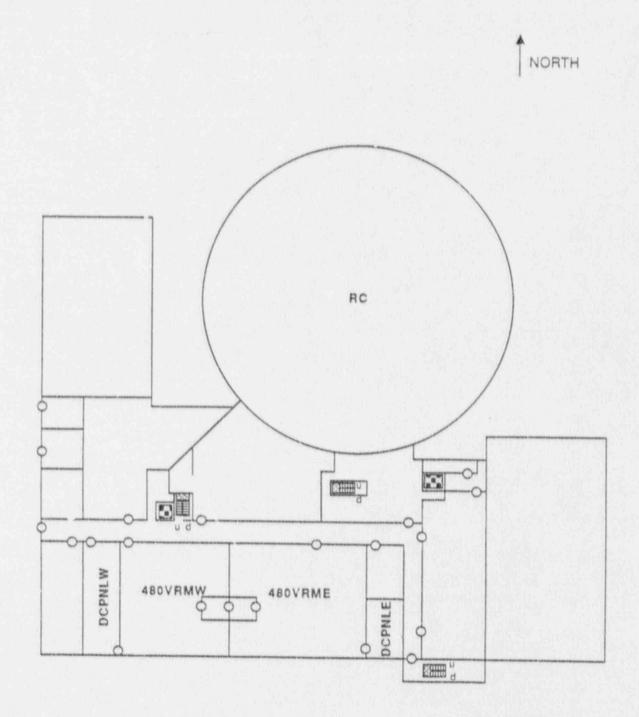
Rancho Seco Containment and Auxiliary Buildings, Elevation 20 ft.
